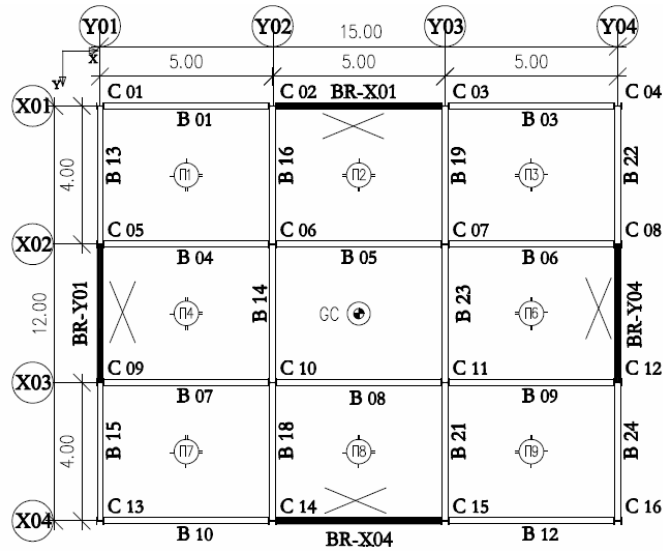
Typical layout of 3-story torsionally stiff steel buildings.
